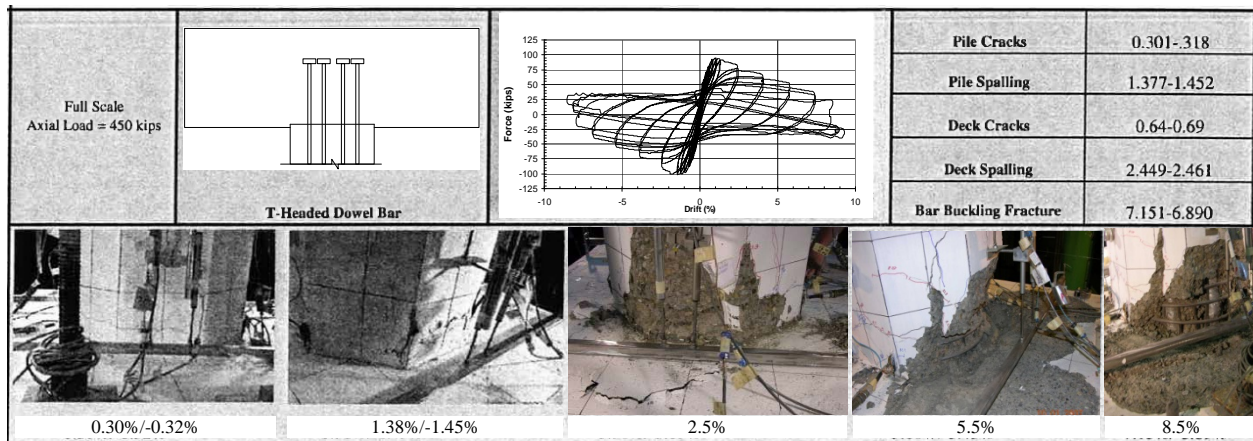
Traditional Pile Connection Test Results (Photo by Charles Roeder, Univ. of Washington)
